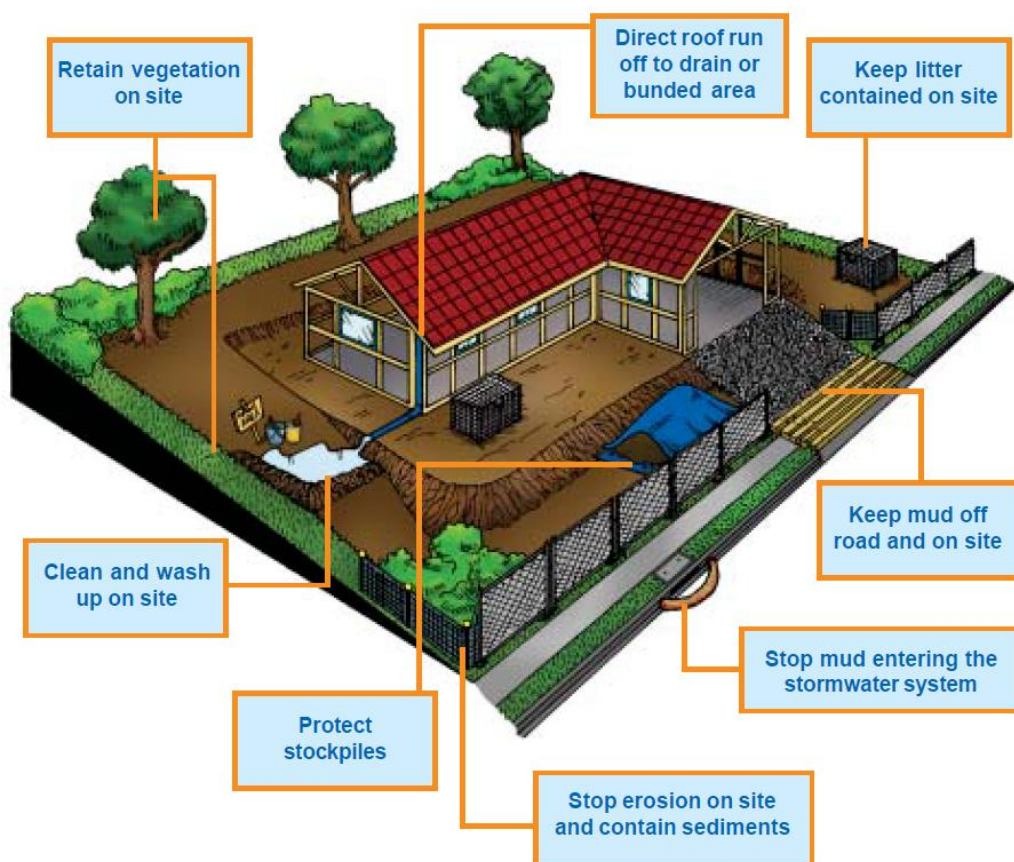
Schematic overview of the on-site stormwater management practices during construction
